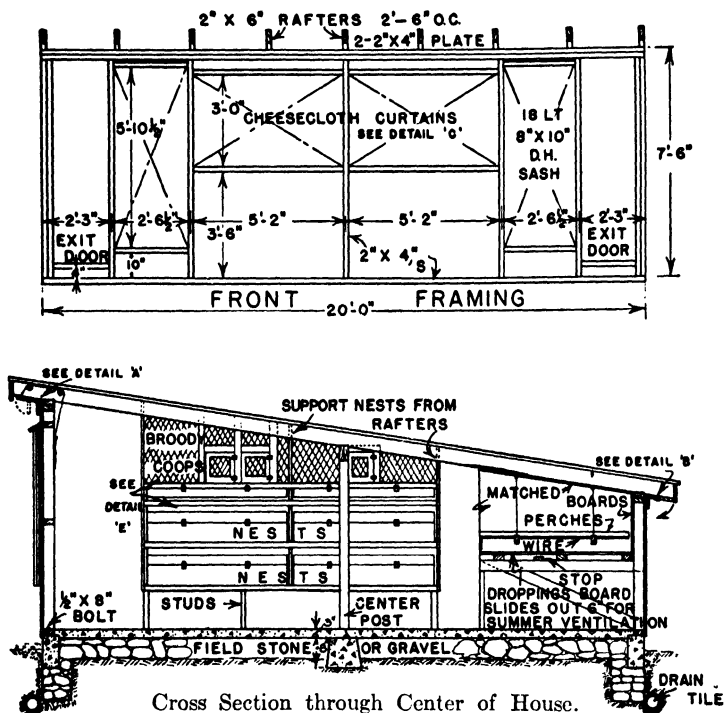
20' X 20' Cornell laying house. Note location of drain tile and construction of foundation and floor.
